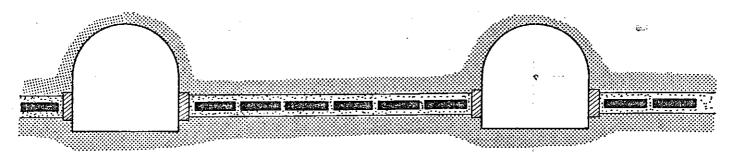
Layout for Disposal Tunnel and Pit (Option A)
